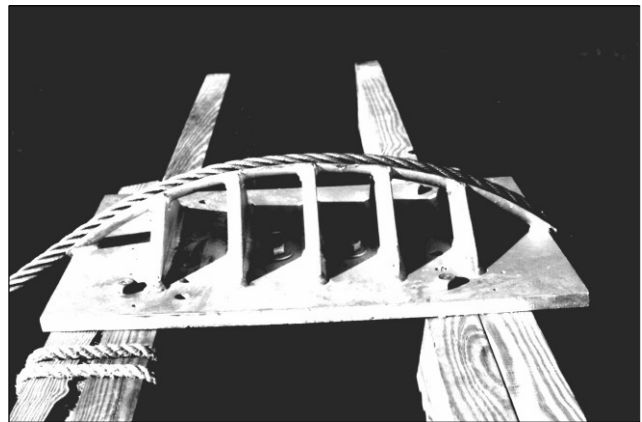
West tower - north pole cable saddle. Photo courtesy of Mr. Tibor Latincics.
